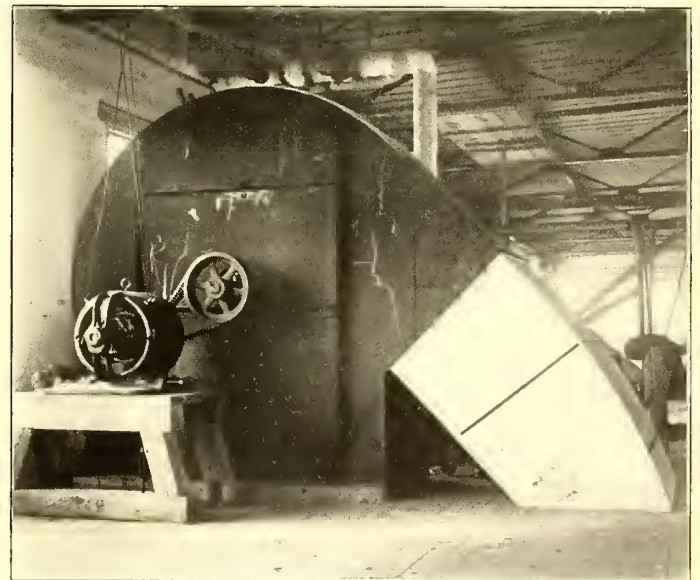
MOTOR-DRIVEN HEATING FAN WITH CHAIN GEAR
